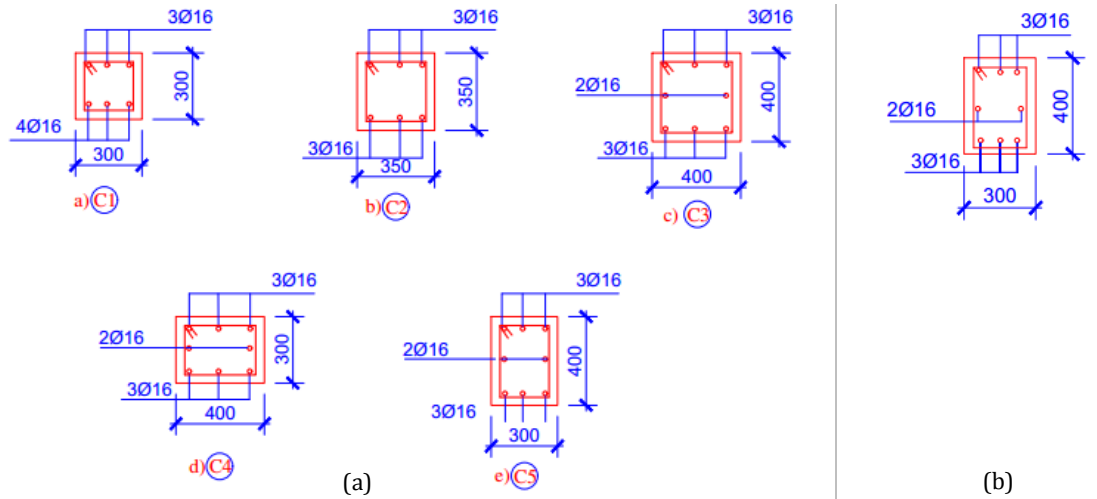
a) Column and, b) Beam reinforcement details for 3-story frame (units in mm).
